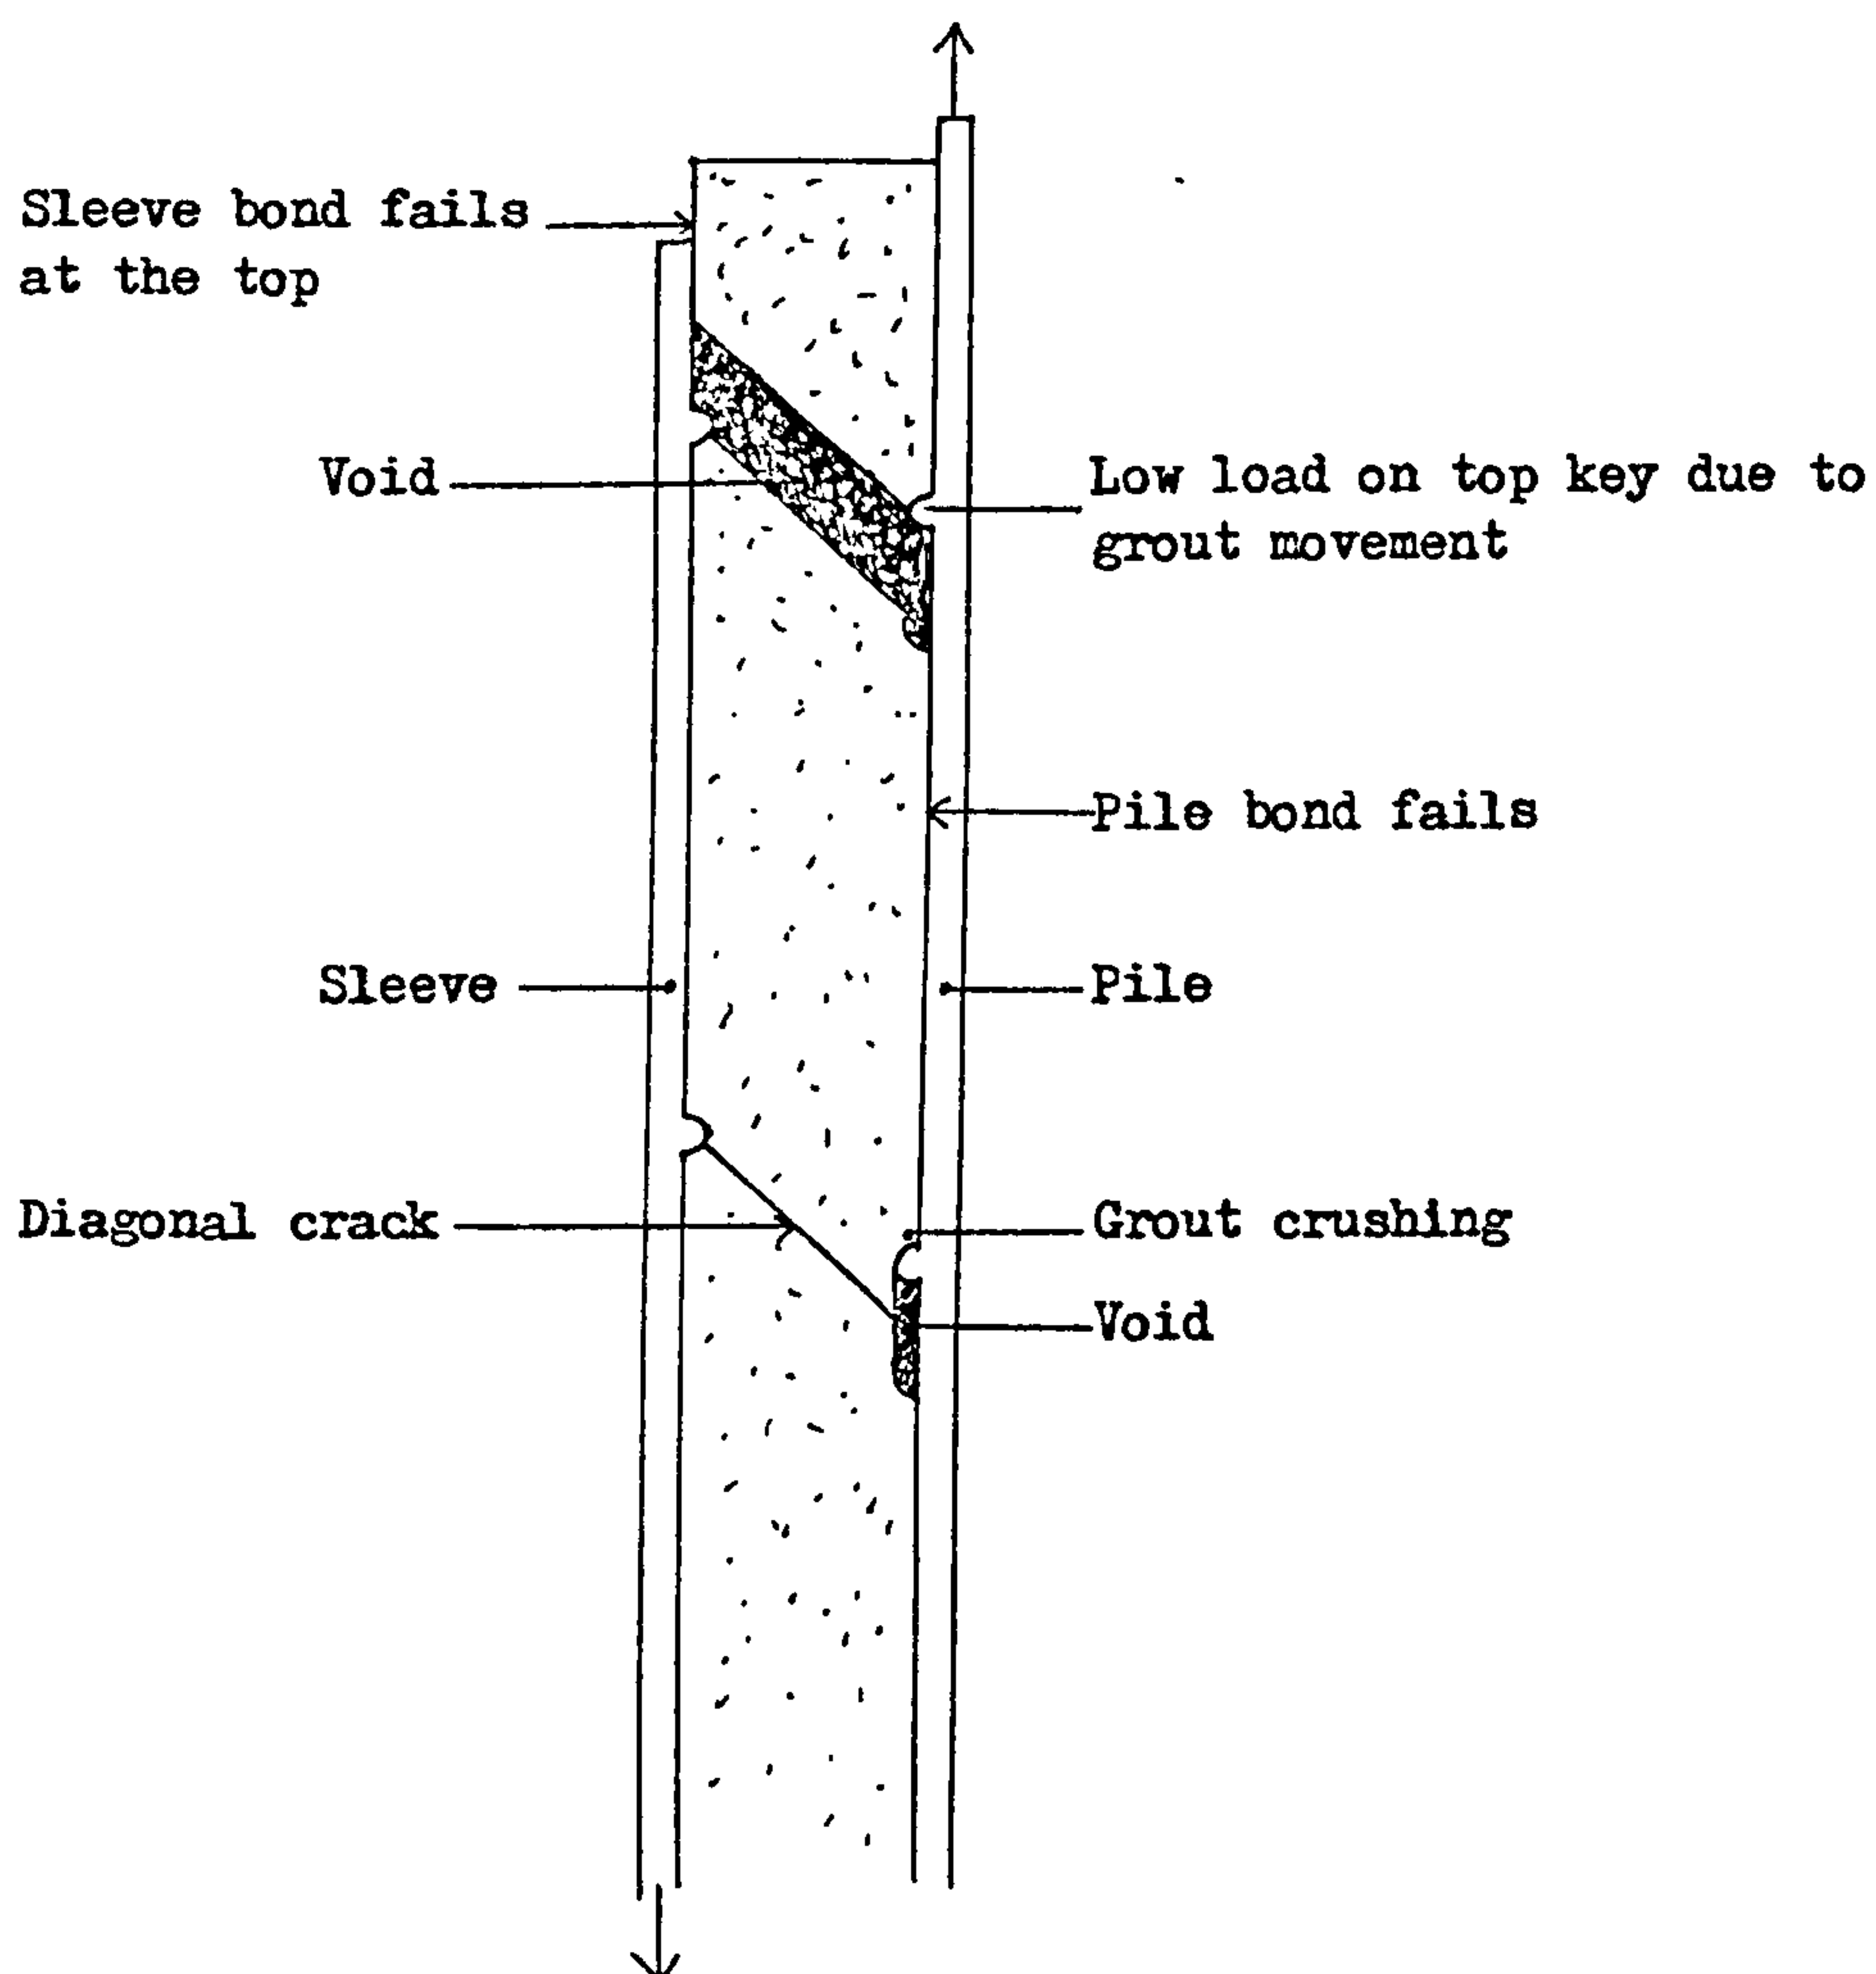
TYPICAL A-SERIES FAILURE MECHANISM.
